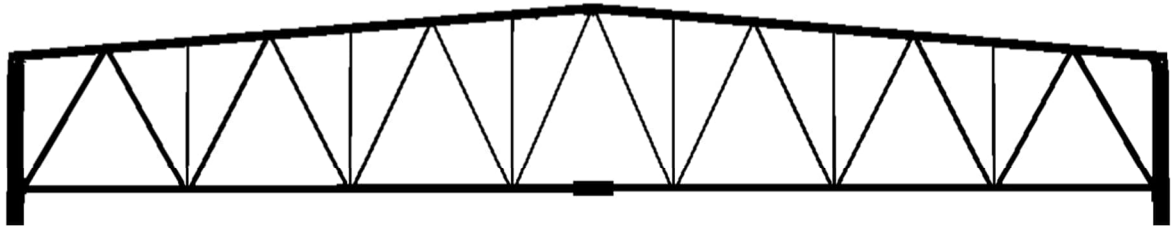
Typical truss configuration with roof slope of 1:20 (~3°) [31]
